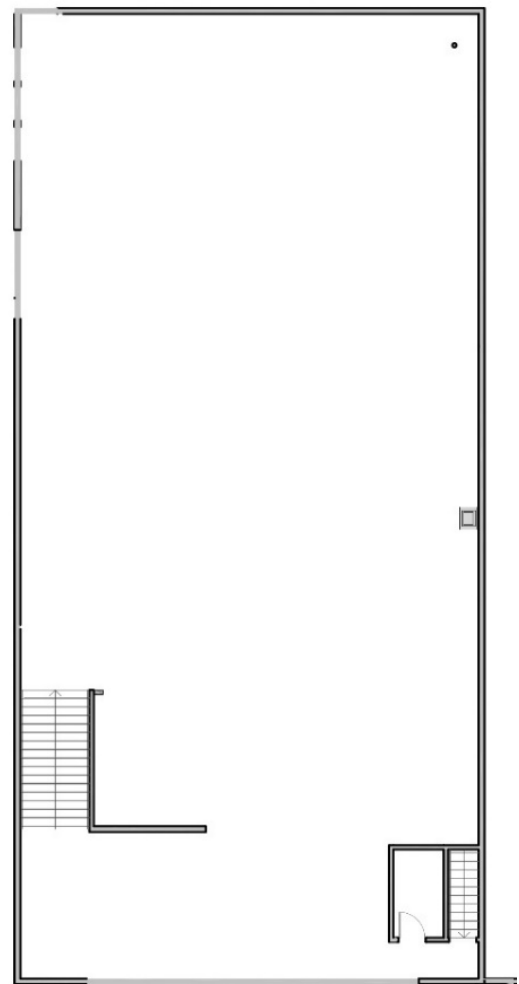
Existing second floor that BoxJelly will occupy as part of their expansion.
